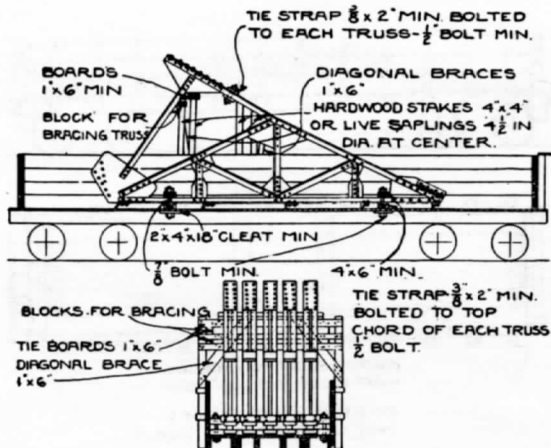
LOADING OF STEEL HALF-ROOF TRUSSES.
